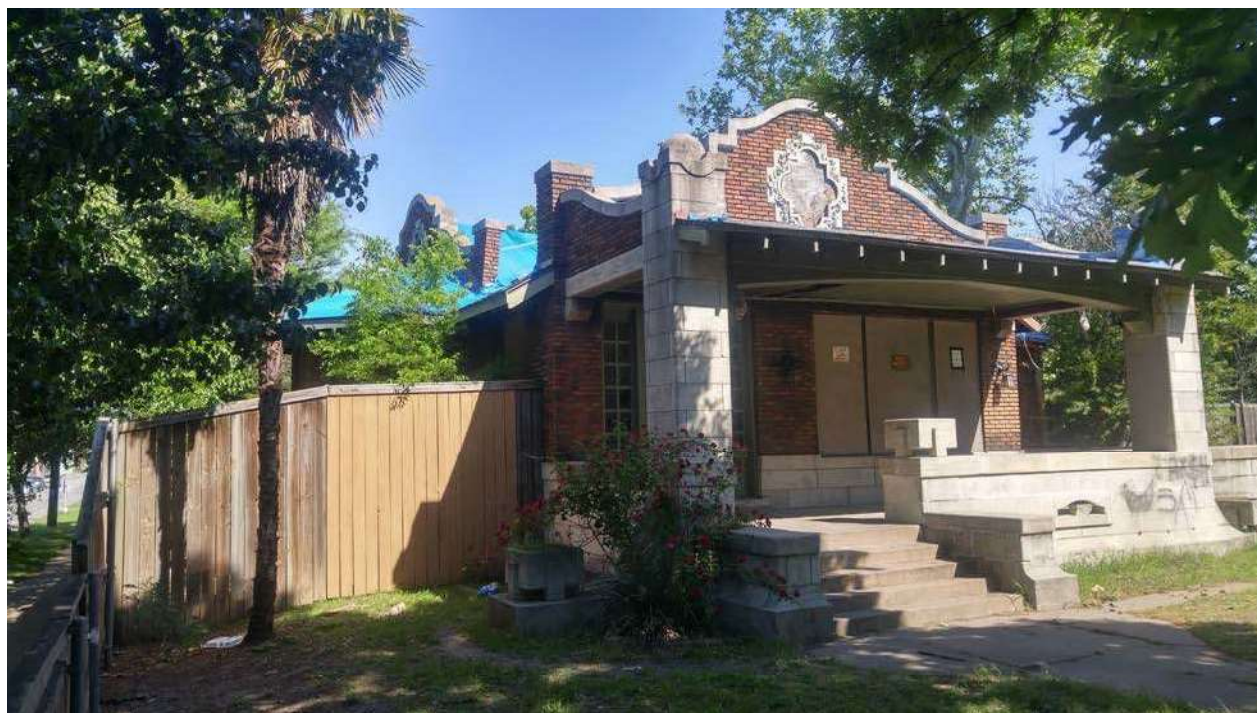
Bianchi House, Southwest & Southeast Elevations, April 2018
